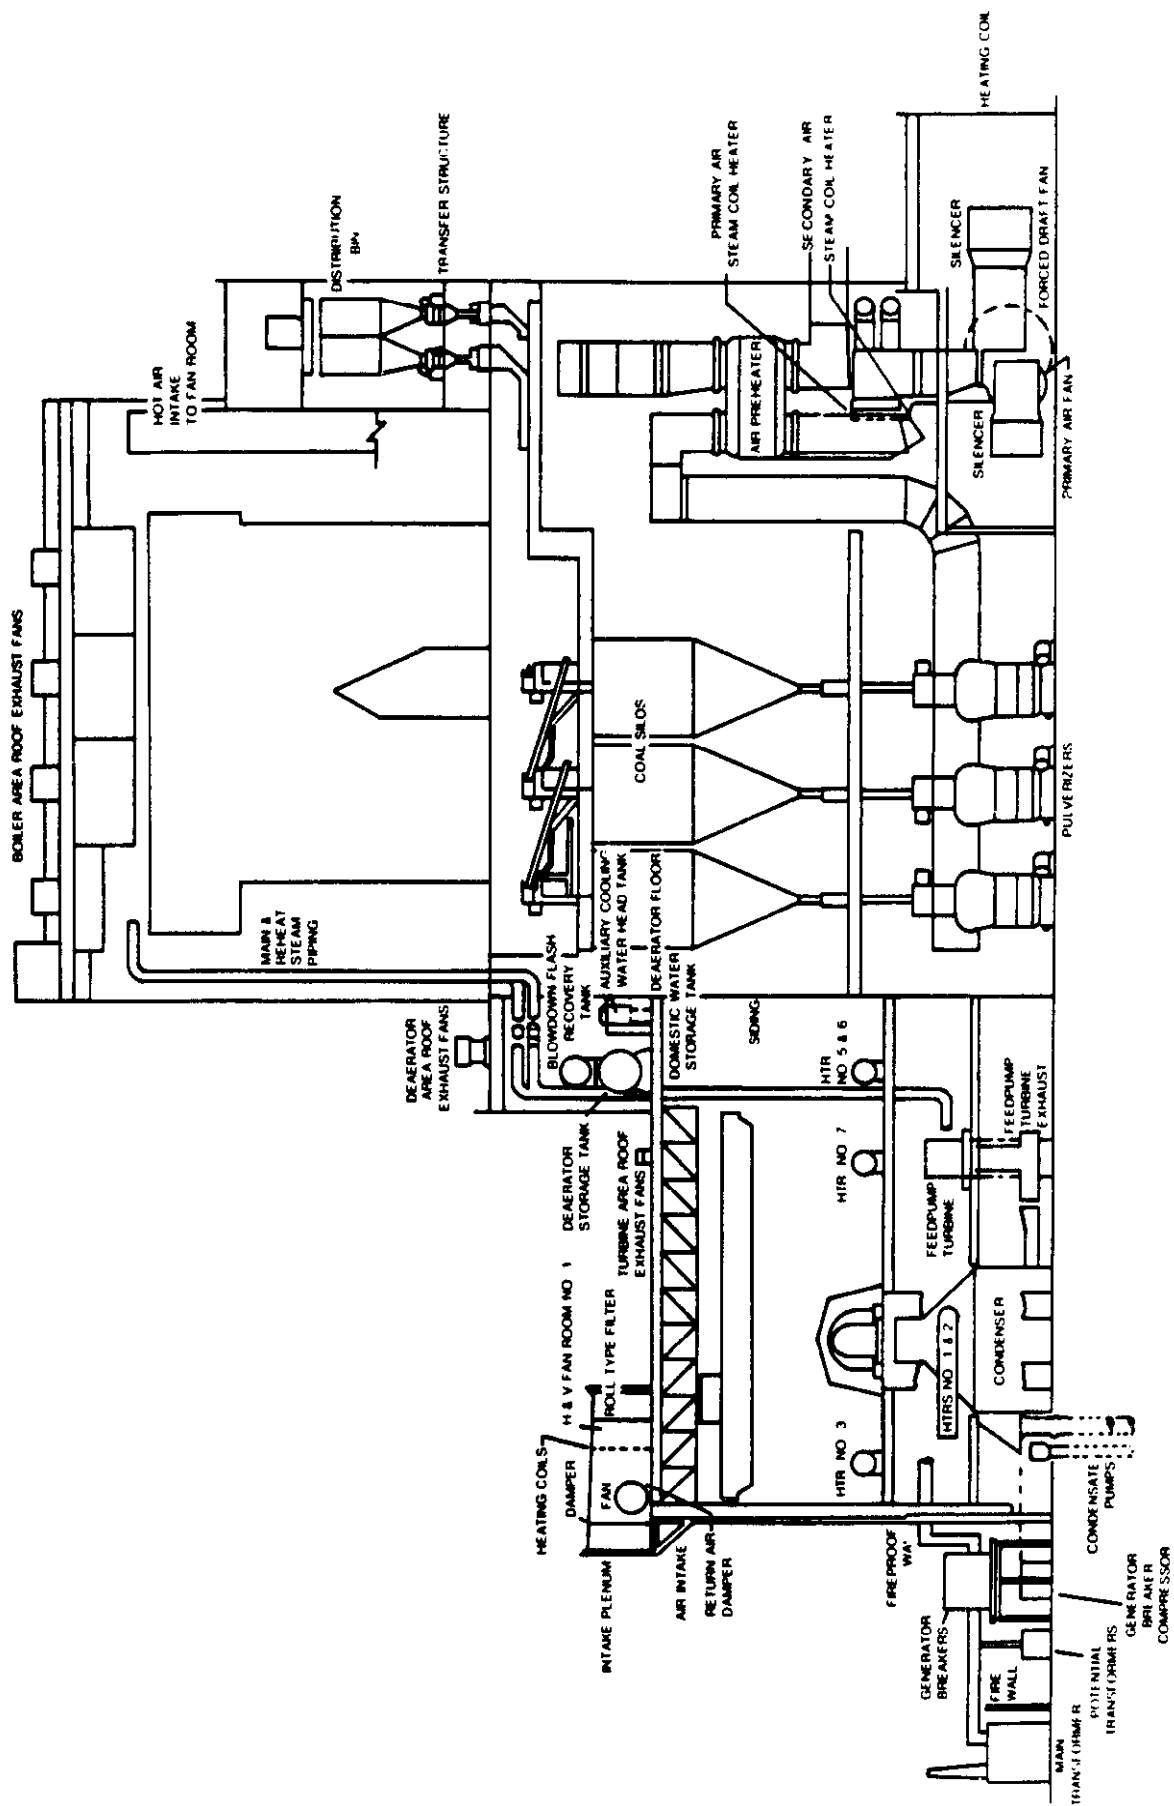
300 MWe Reference Plant Arrangement Elevation
